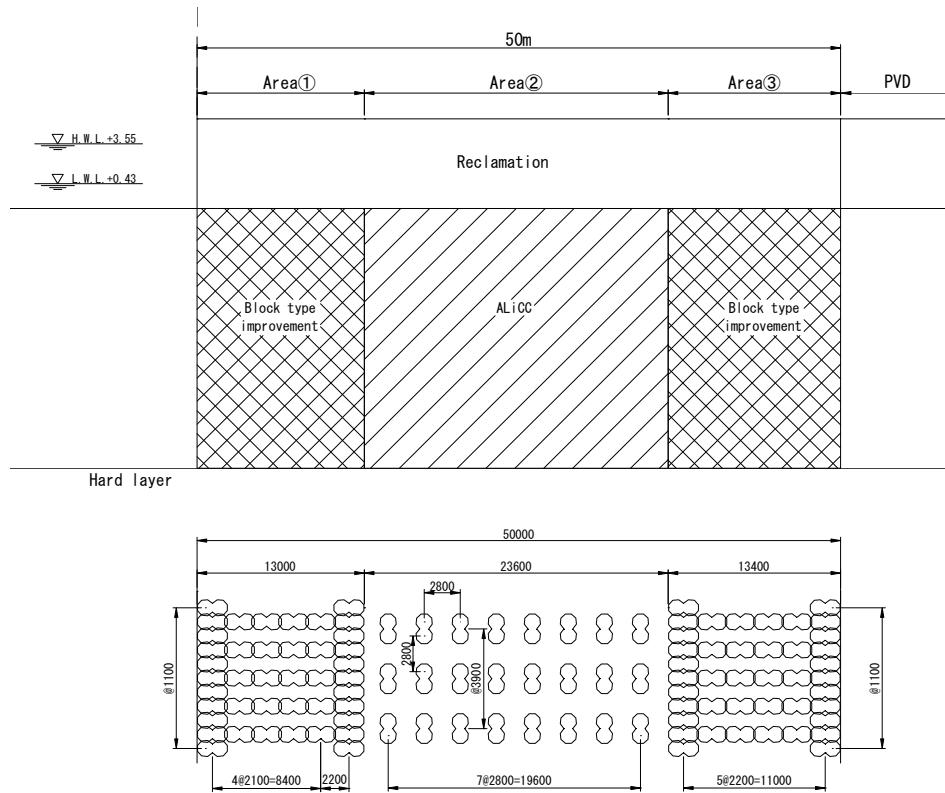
Proposed Arrangement of Cement Deep Mixing Method (Detailed Design Stage)
